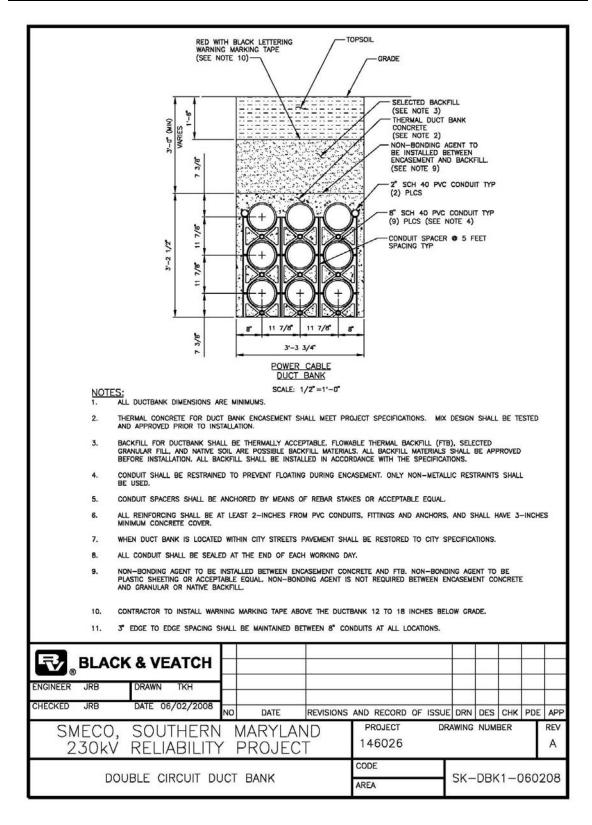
Typical Double Circuit Duct Bank Details
